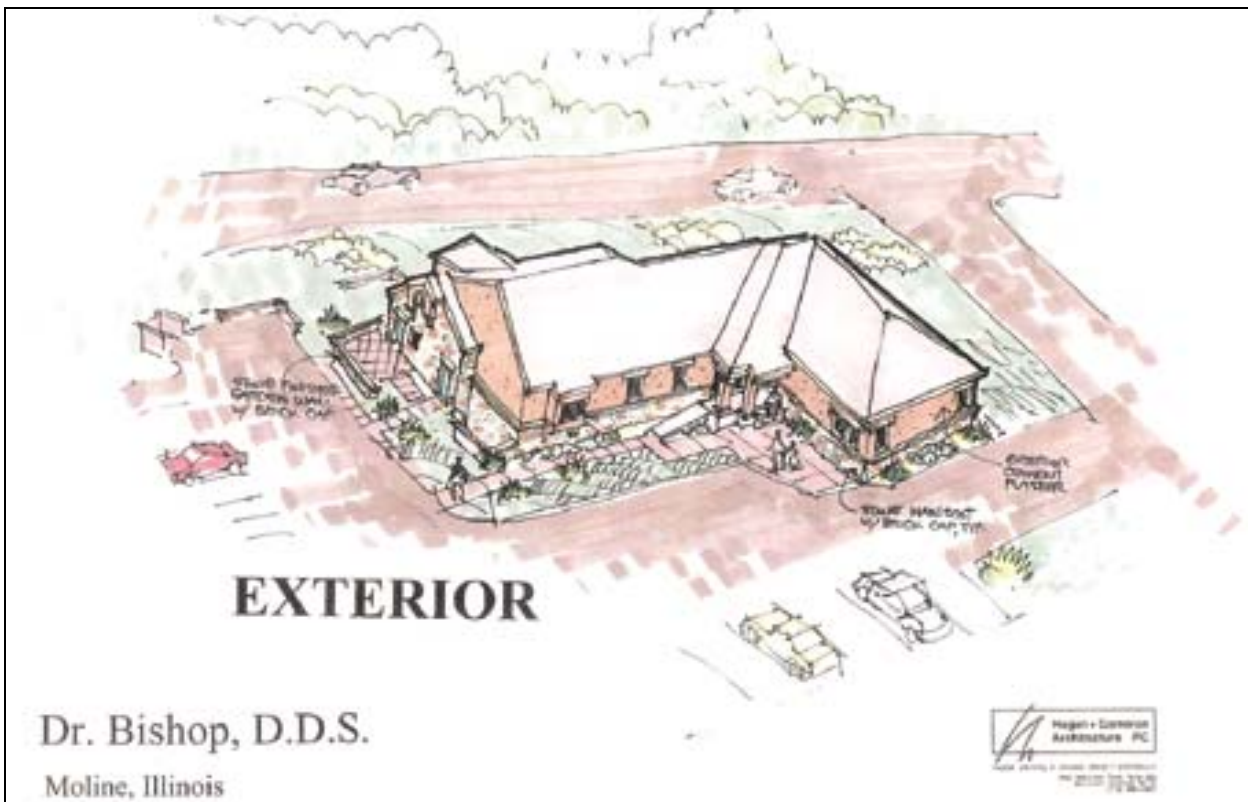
Color sketch of preliminary elevations and building site placement for Dr. Catherine Bishop, Moline, IL.
